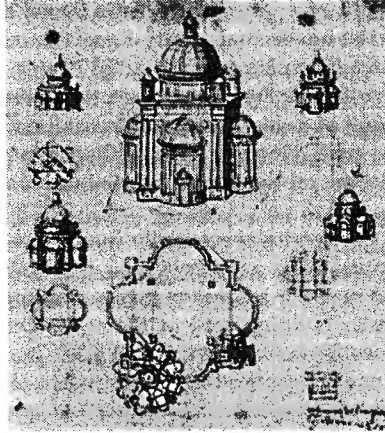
Leonardo. Church with cross-shaped plan. Ashburnham MS 2037, f.3v.
